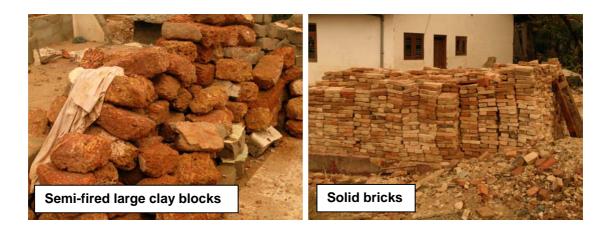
Semi-fired large clay blocks and solid bricks typically used for masonry construction
